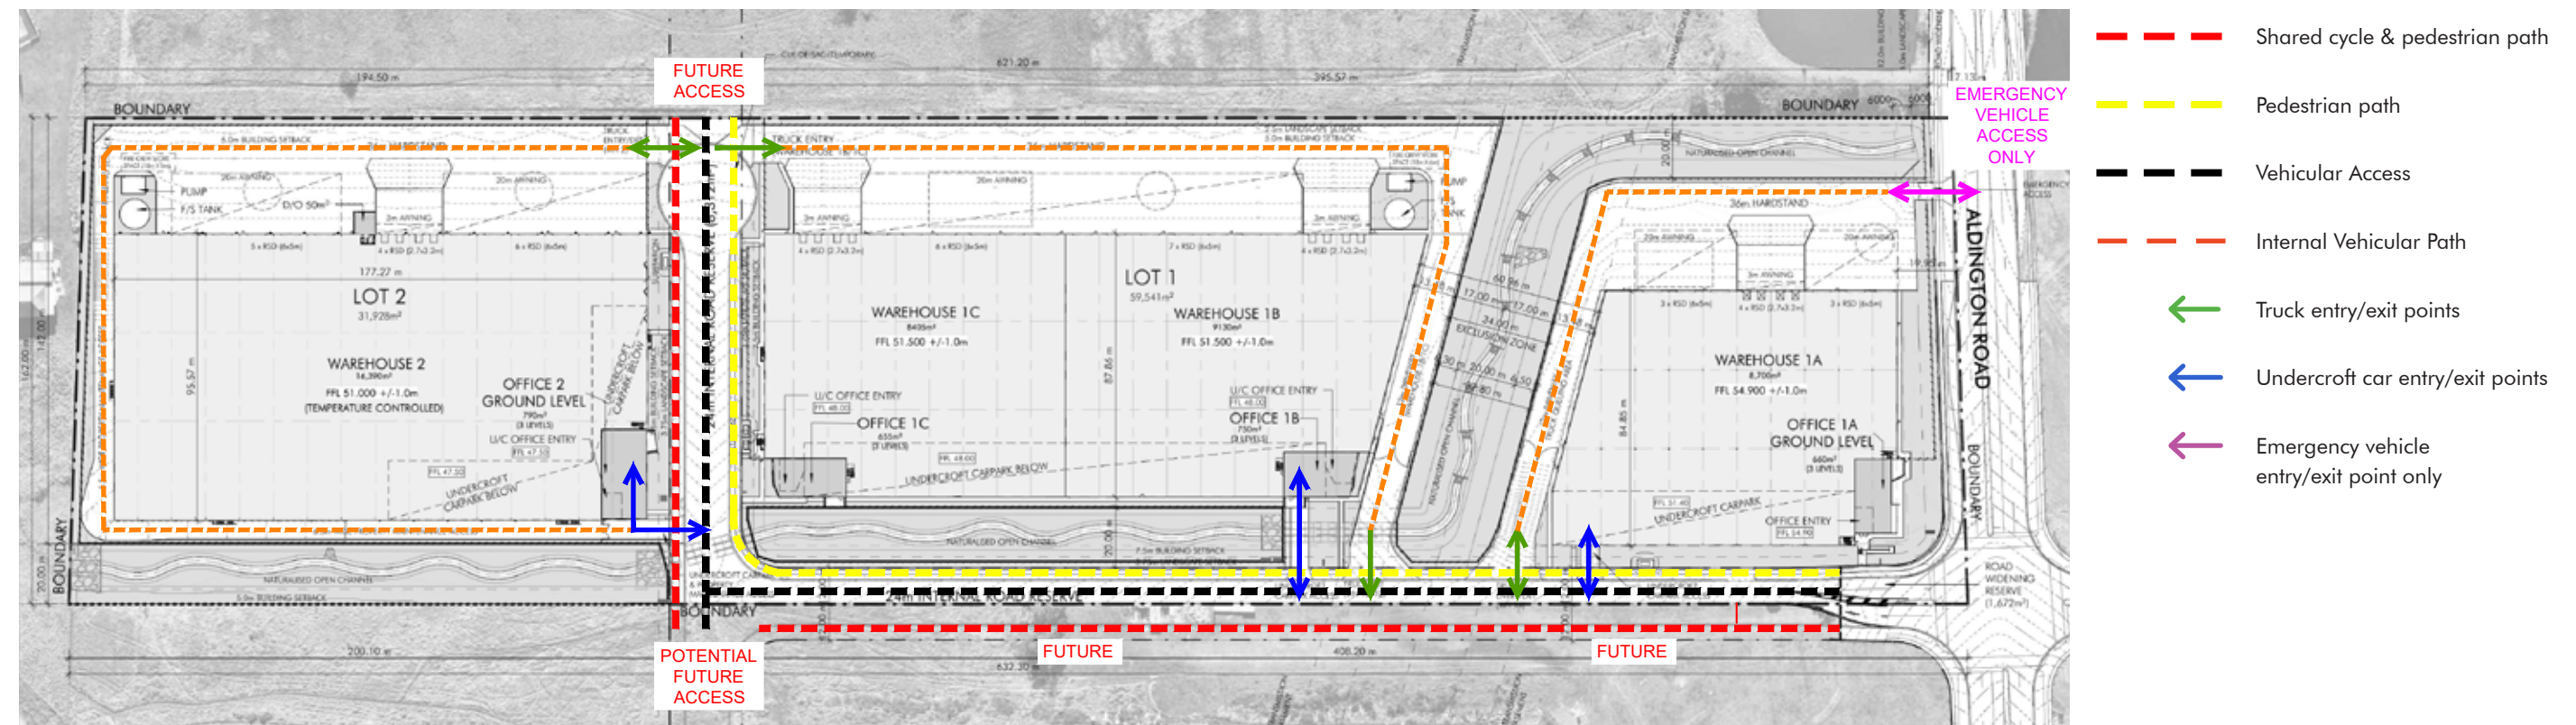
Westgate Master Plan Cycleways & Vehicular Access
